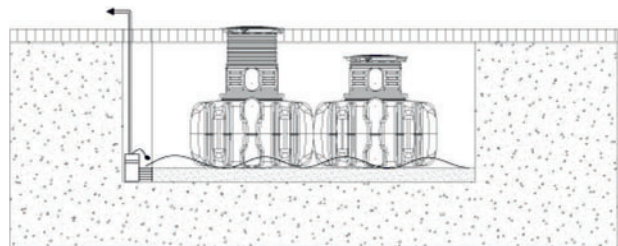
Installation in a pit carrying water – example 5th FLAT
